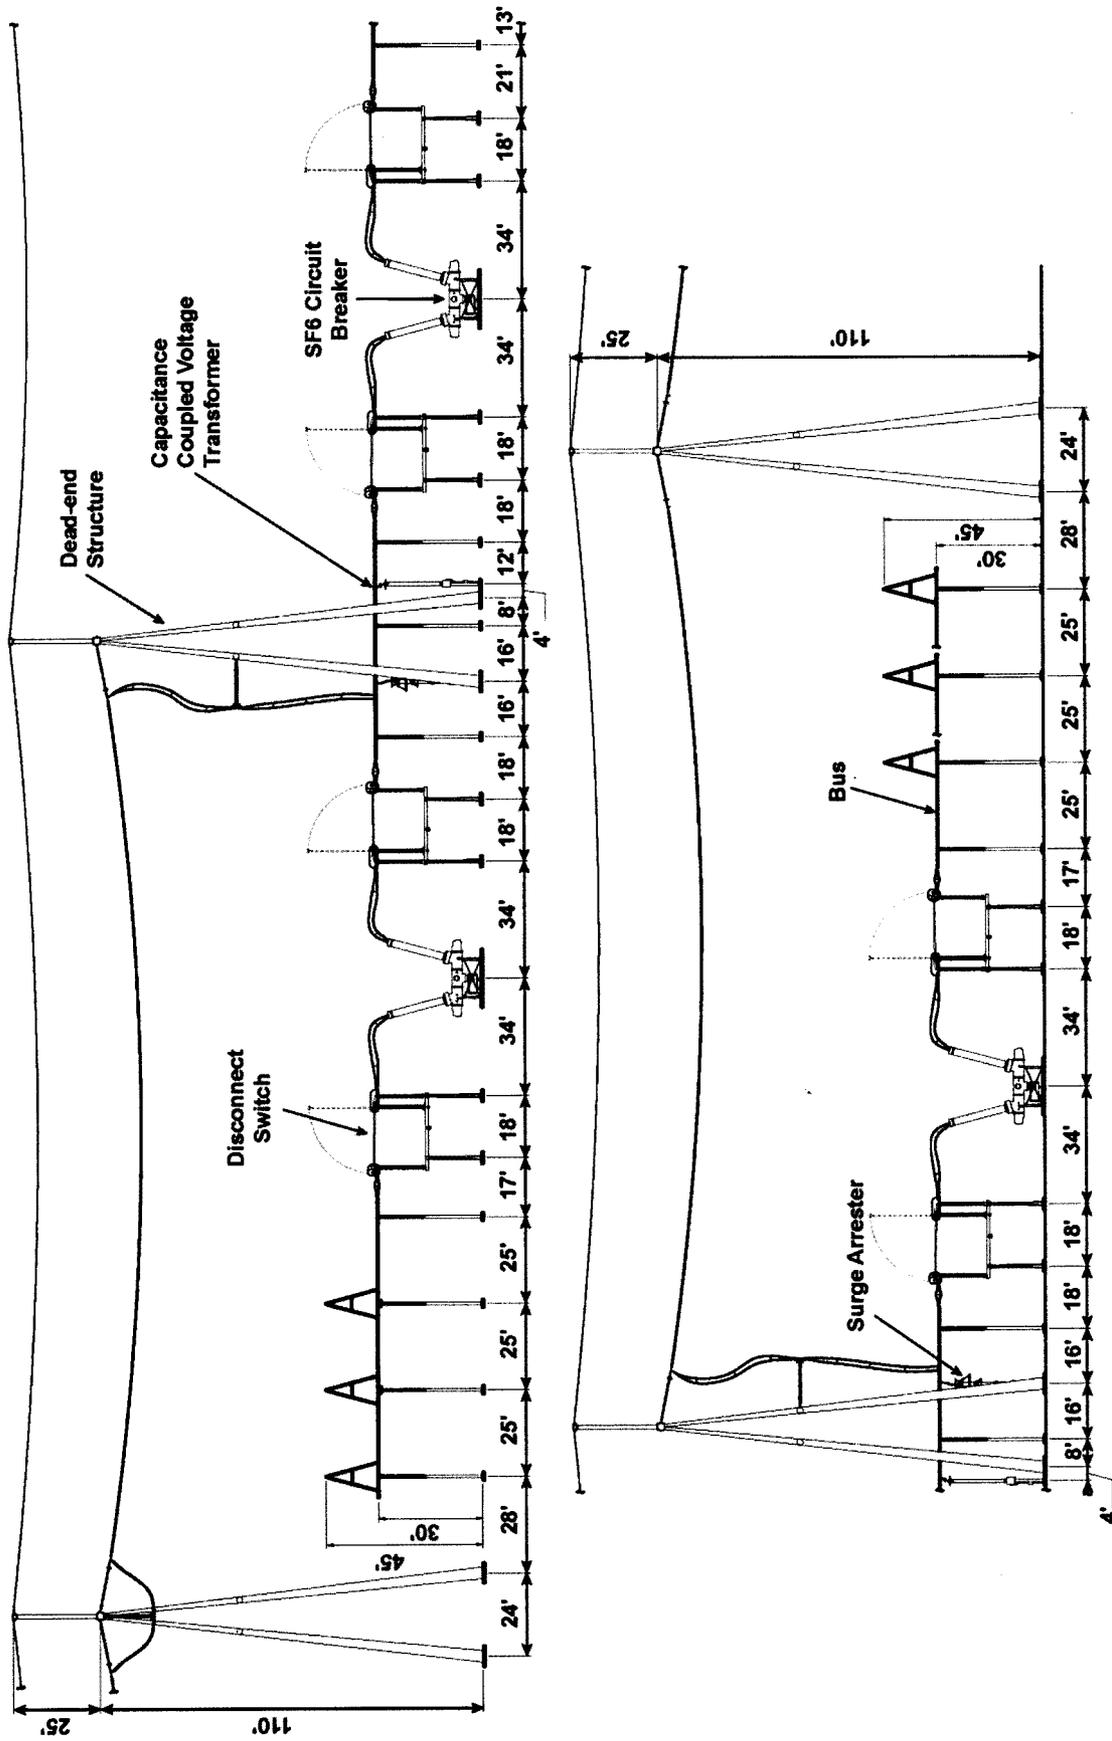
Typical 500 kV Substation Schematic – Elevation View
